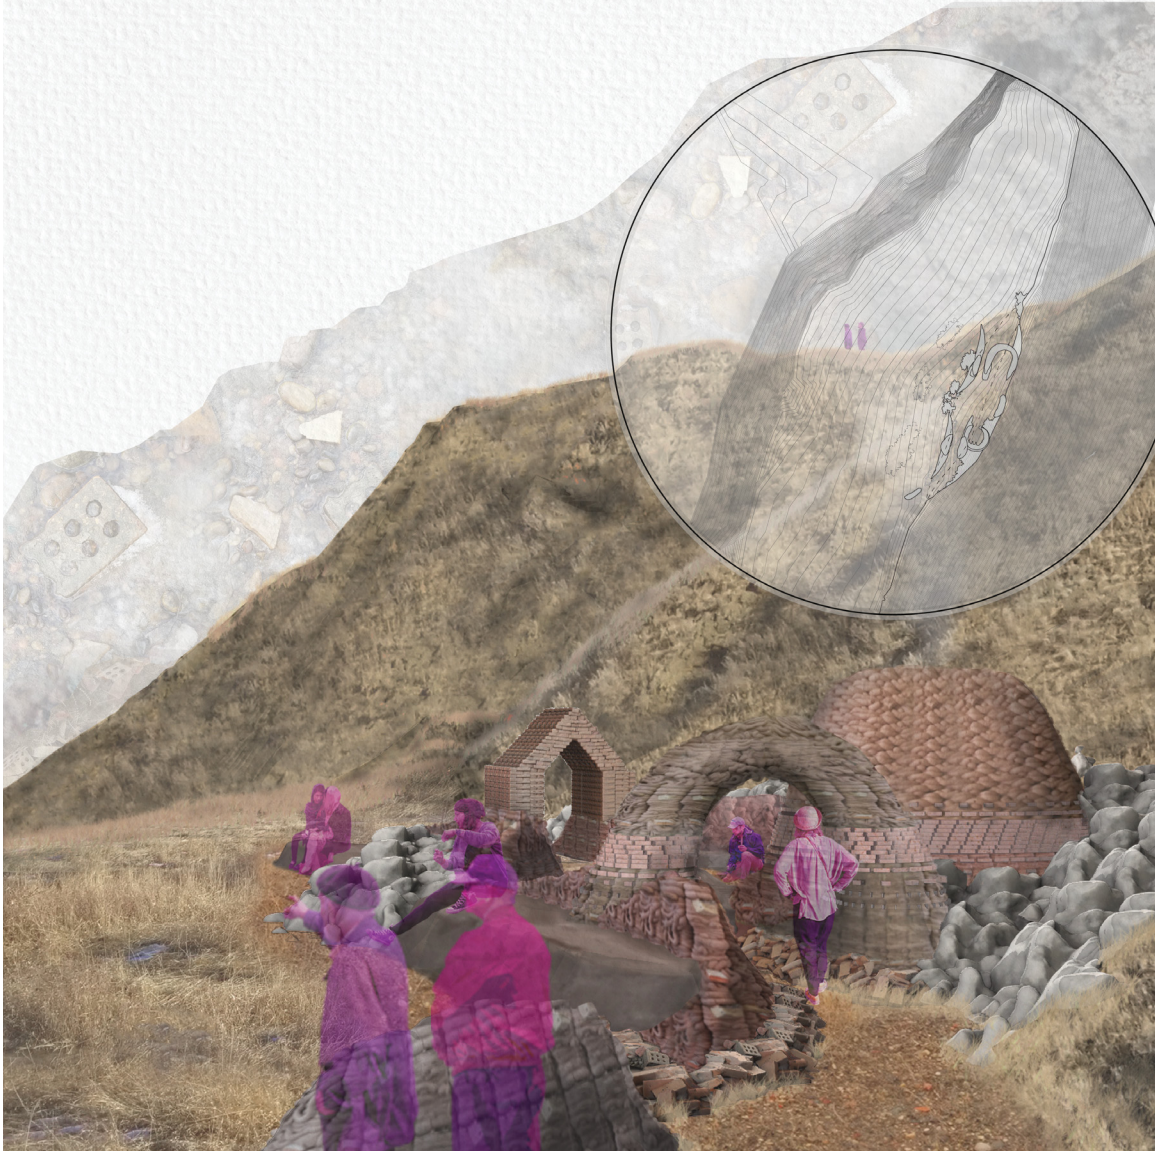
Approach to pavilion C. Site plan ghosted in background. Base layers from: (GIS Medicine Hat, 2010).
